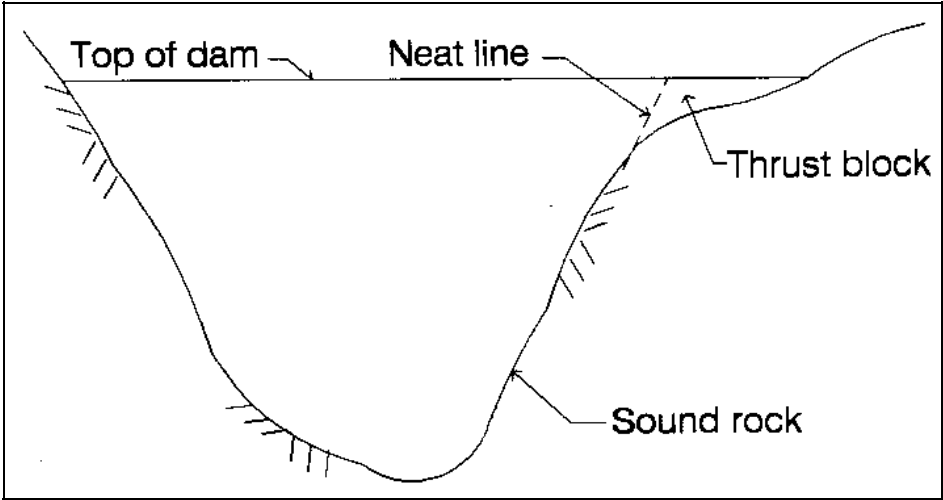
Schematic elevation of simple thrust block as a right abutment extension of an arch dam
